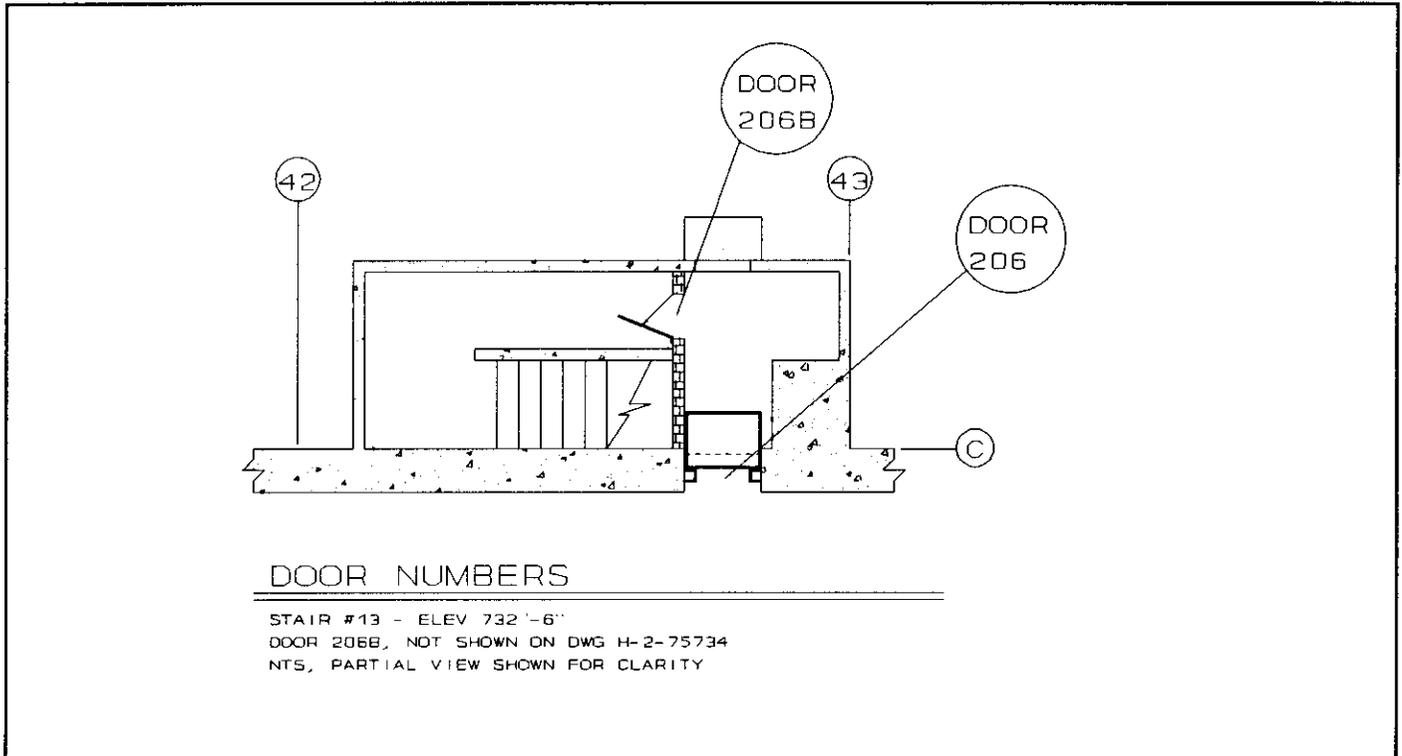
, ADDITIONAL DOOR NUMBER, STAIRWELL AT COLUMN 42
